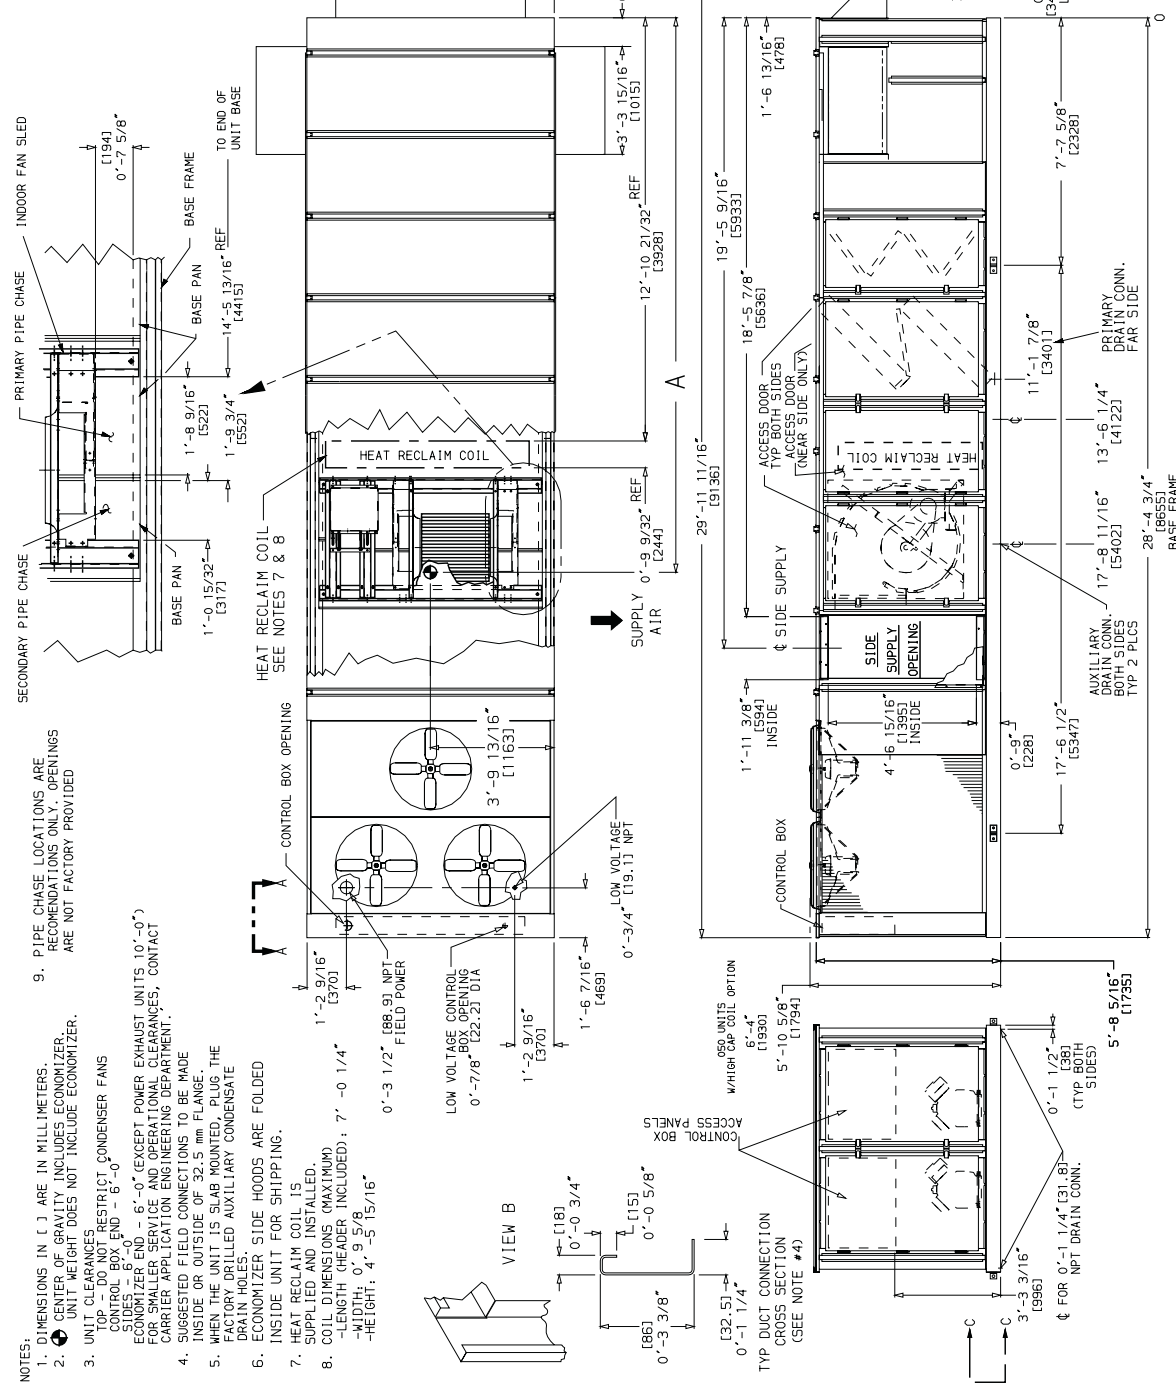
Base Unit Dimensional Drawing — 50ZI,ZW075-105 (Units with High-Capacity Power Exhaust)
